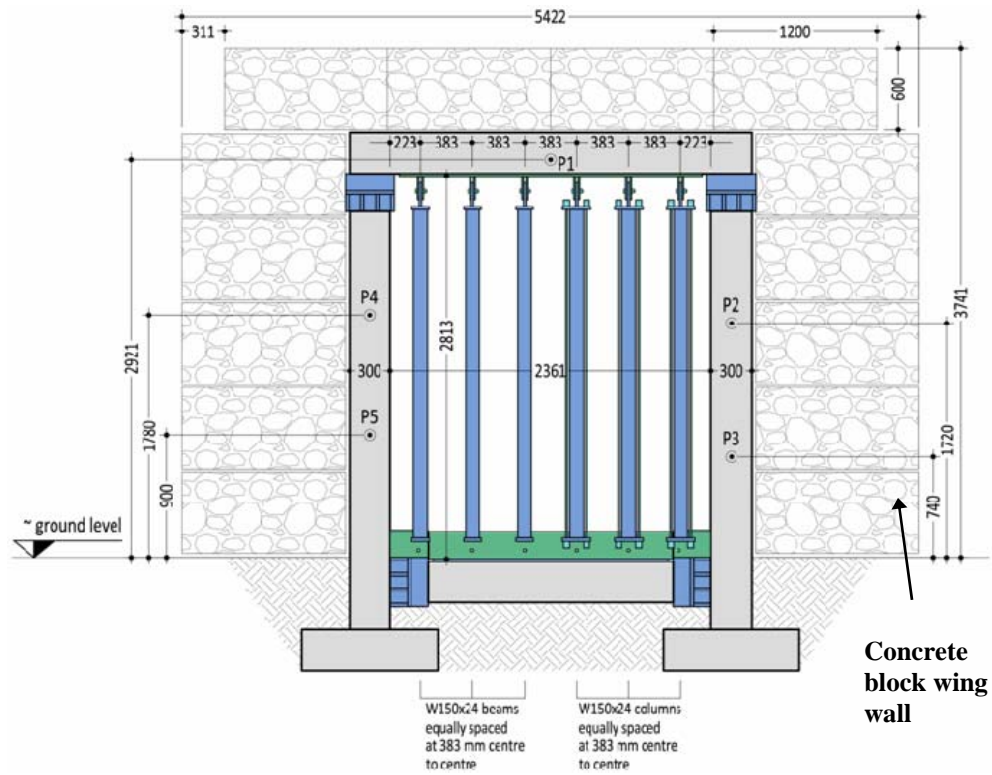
Dimensions of the test frame and the reflecting surface (in mm)
